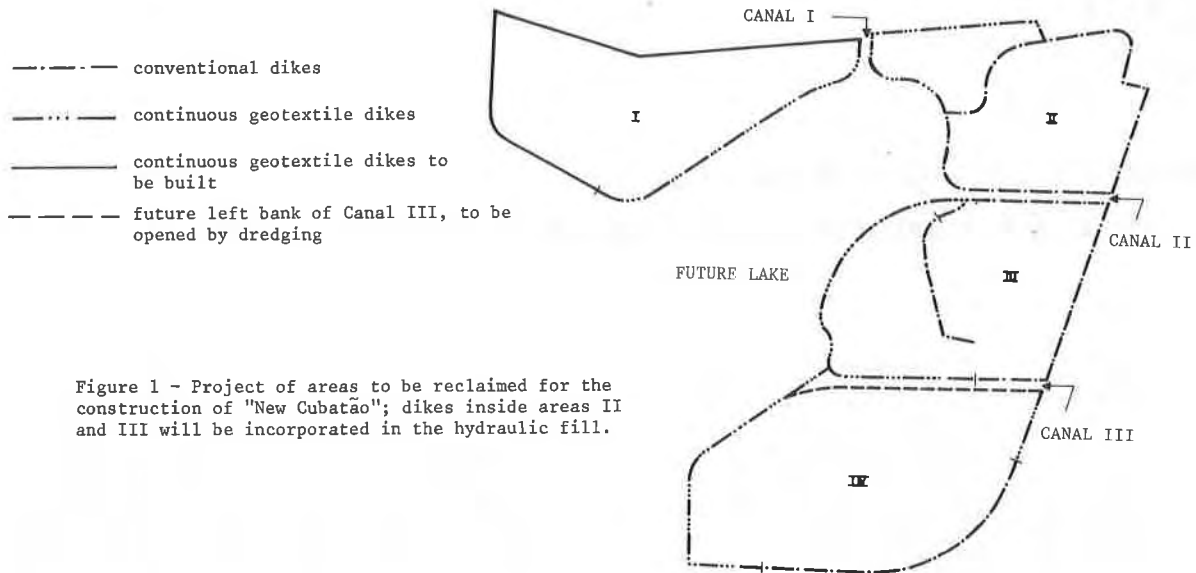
Project of areas to be reclaimed for the construction of "New Cubatão"; dikes inside areas II and III will be incorporated in the hydraulic fill.
